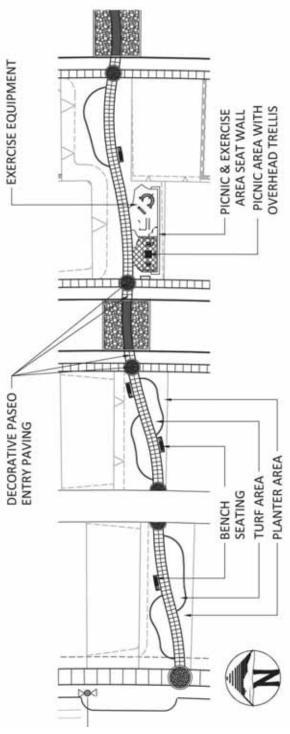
Private Open Space (POS-1) - Village Paseo West Segment
